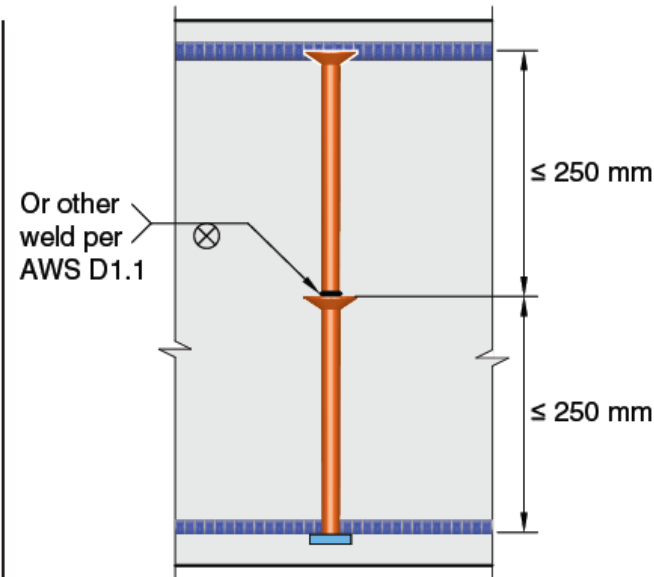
Stacking (piggybacking) of headed shear stud reinforcement.
